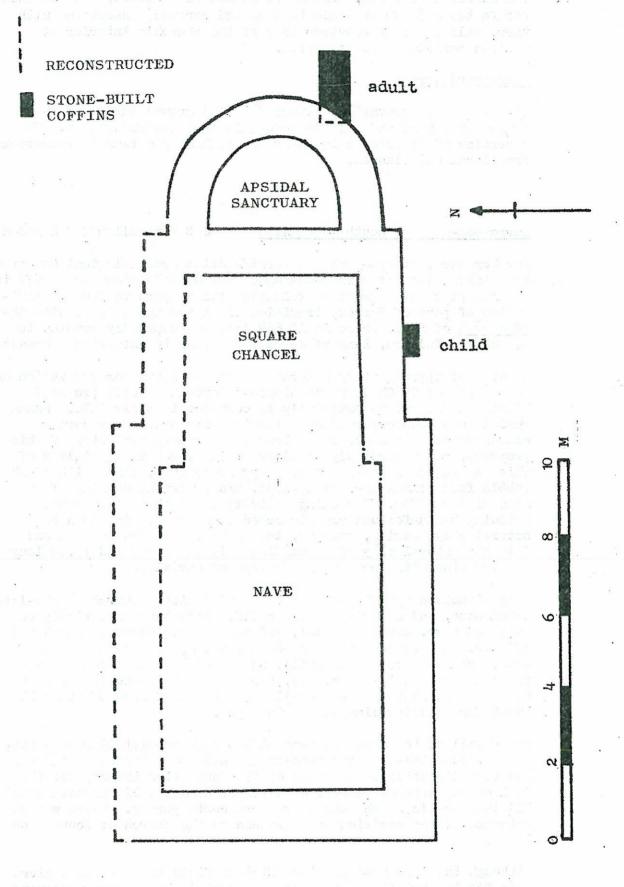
Barrow-on-Humber, block plan of the excavations (Drawing: J. Boden)
